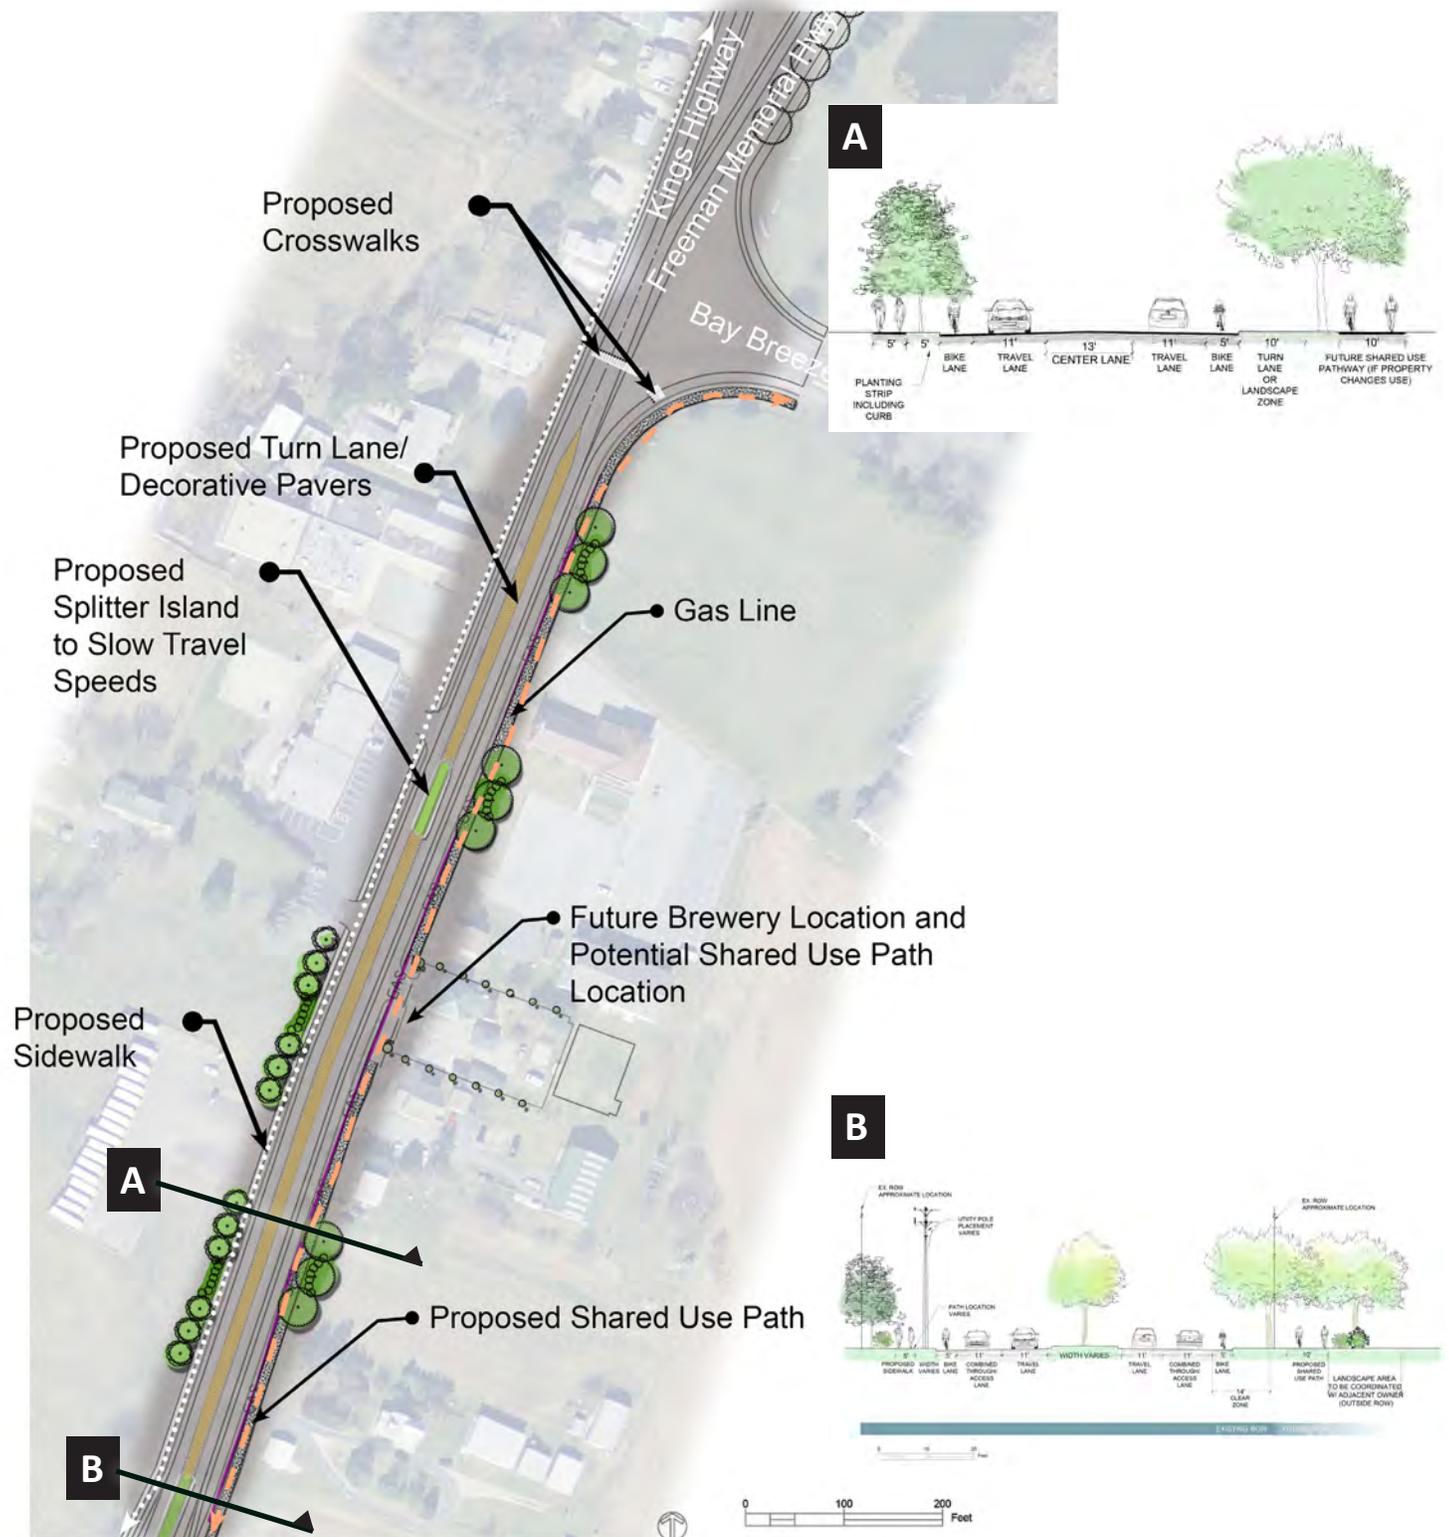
Concept Plan. The concept plan illustrates the major components of the proposed roadway including the center turn lane (with decorative pavement), shared use path, sidewalk, and splitter island. Sections A and B reference the transition of the roadway from having a stormwater catchment median island to a center turn lane.
